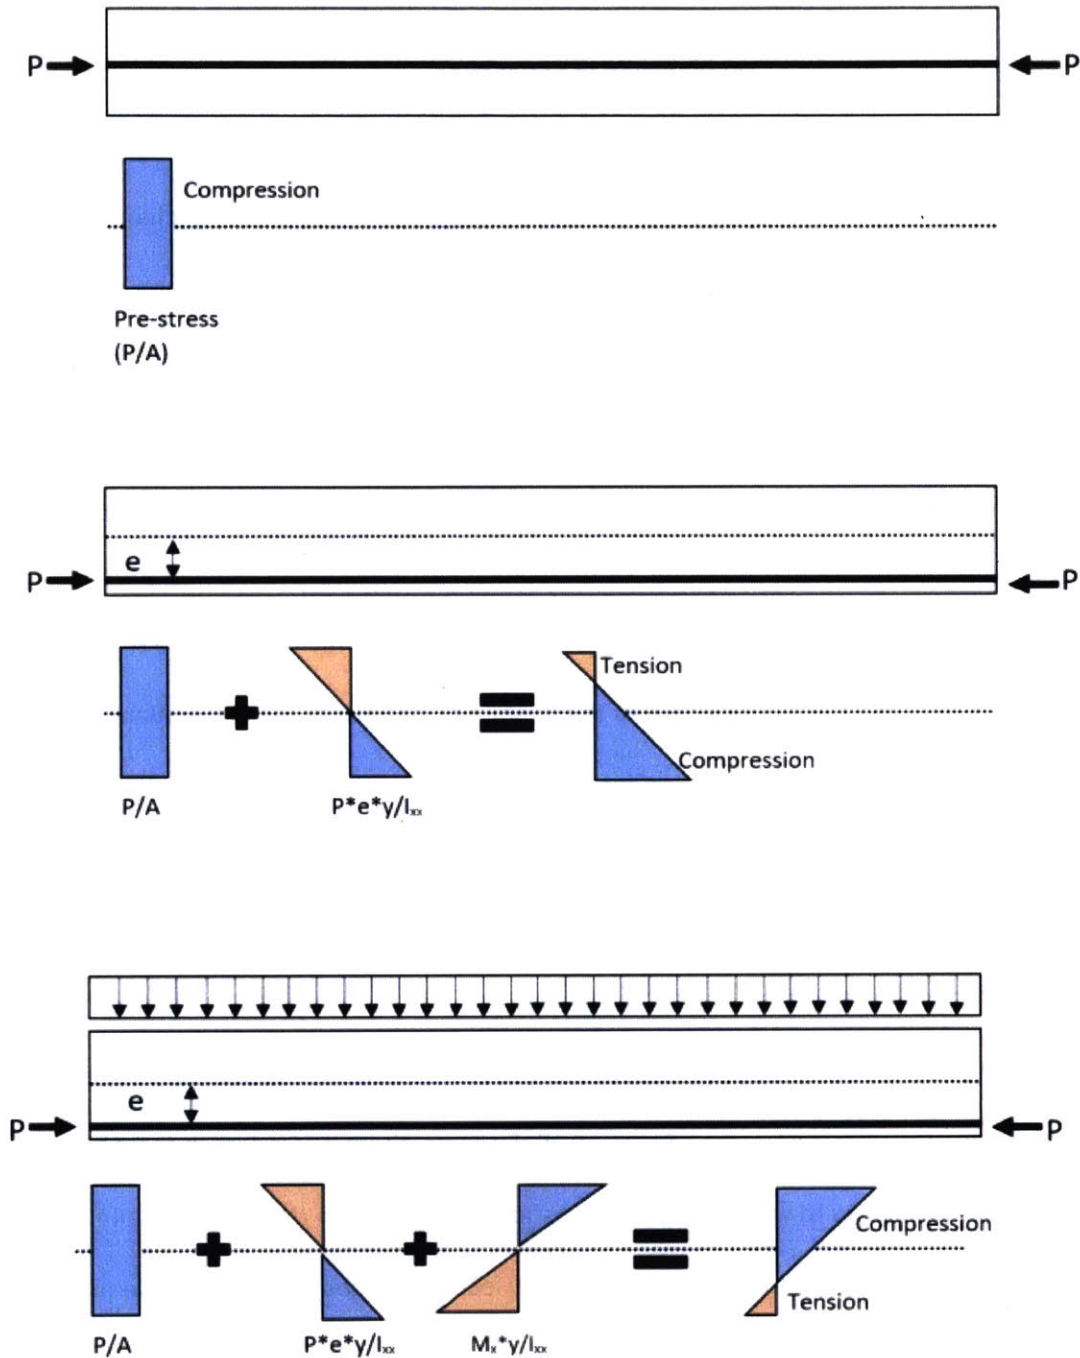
Plane-Stress diagram of prestressing a concrete beam with straight tendons, applying a compressive force P . Adapted from Hurst (1998).
